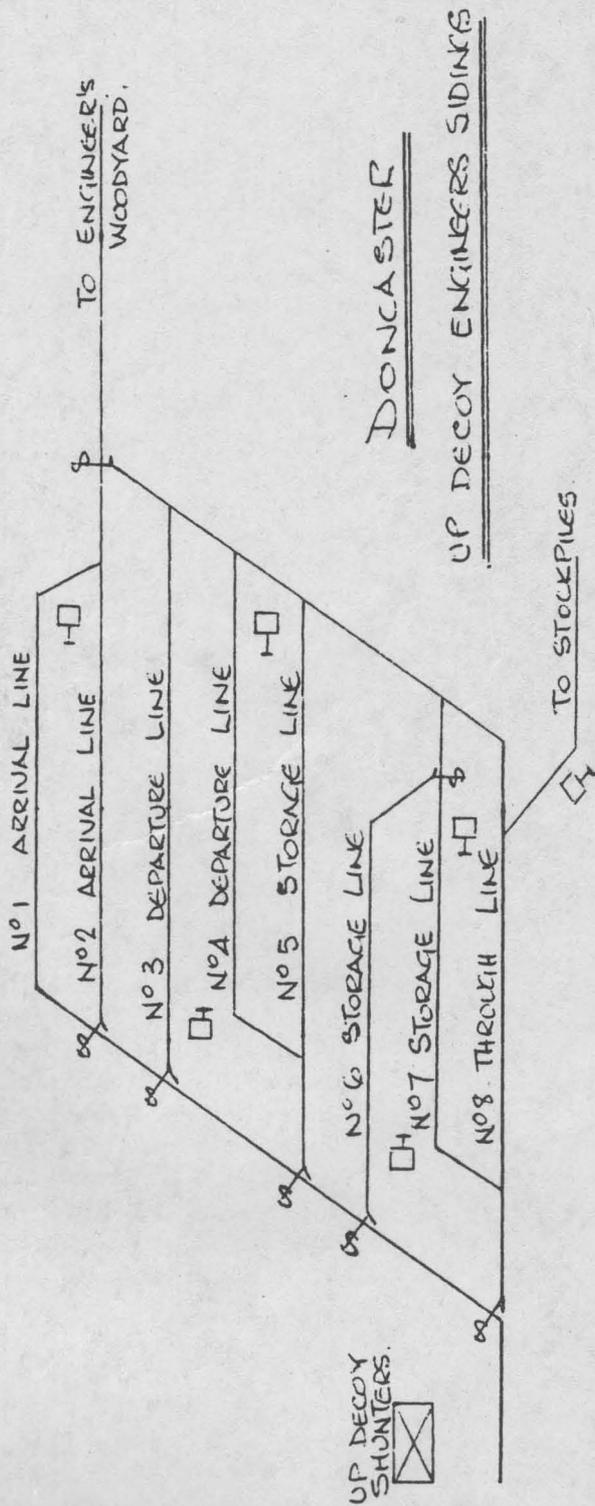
DETAILS OF WORK REFERRED TO IN SECTION B - continued
